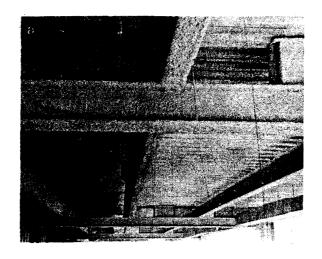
Stub-Girder Floor System Prior to Installation of Ductwork (Sprayed-On Fire Protection Has Been Applied)
